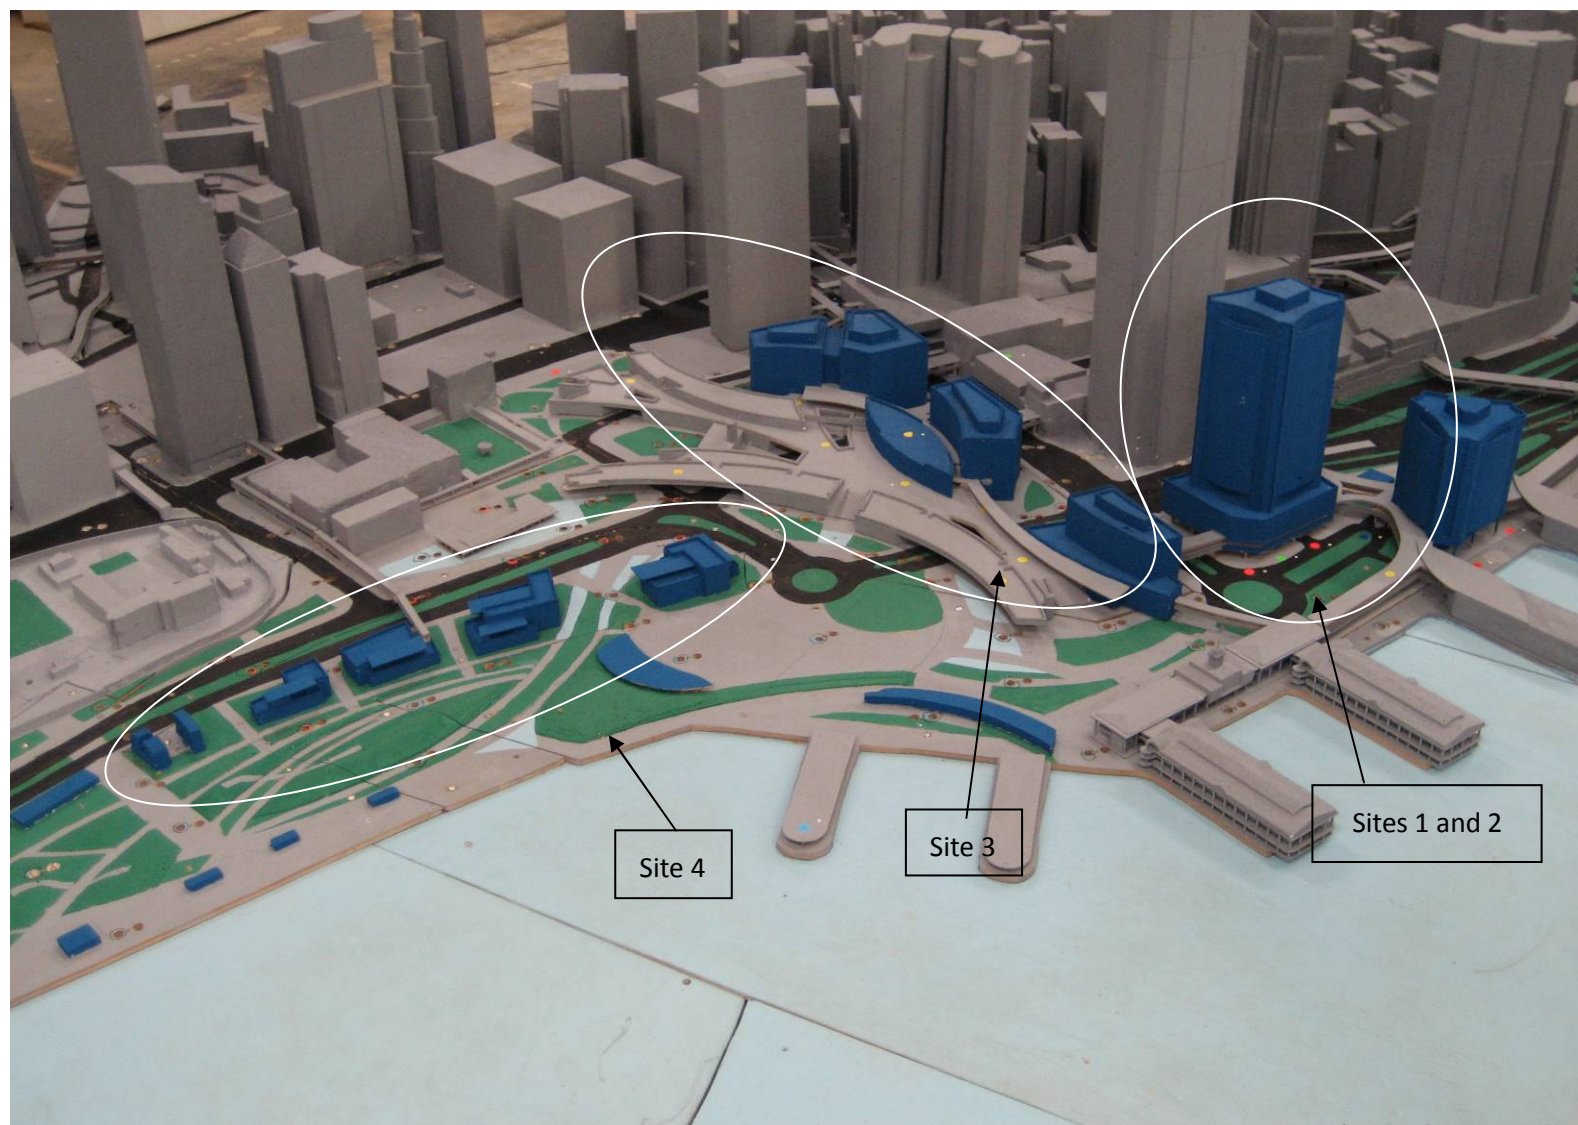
Layout of proposed buildings within the Project Site: Scheme A - Plan
